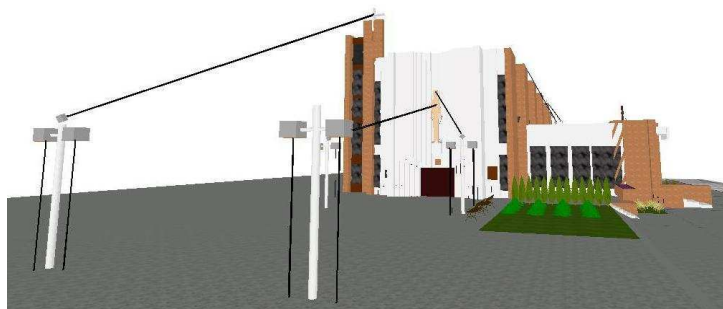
Spatial arrangement of luminaires – view of the southern facade and the square in front of the church
